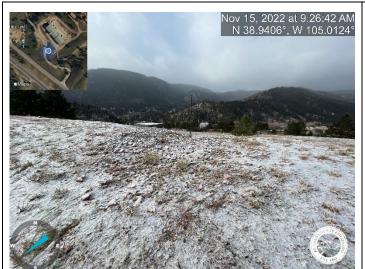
East detention pond; Emergency overflow path is not installed per detail. Provided detail on Sheet C2.9 shows that the path should measure 18' at the base.
